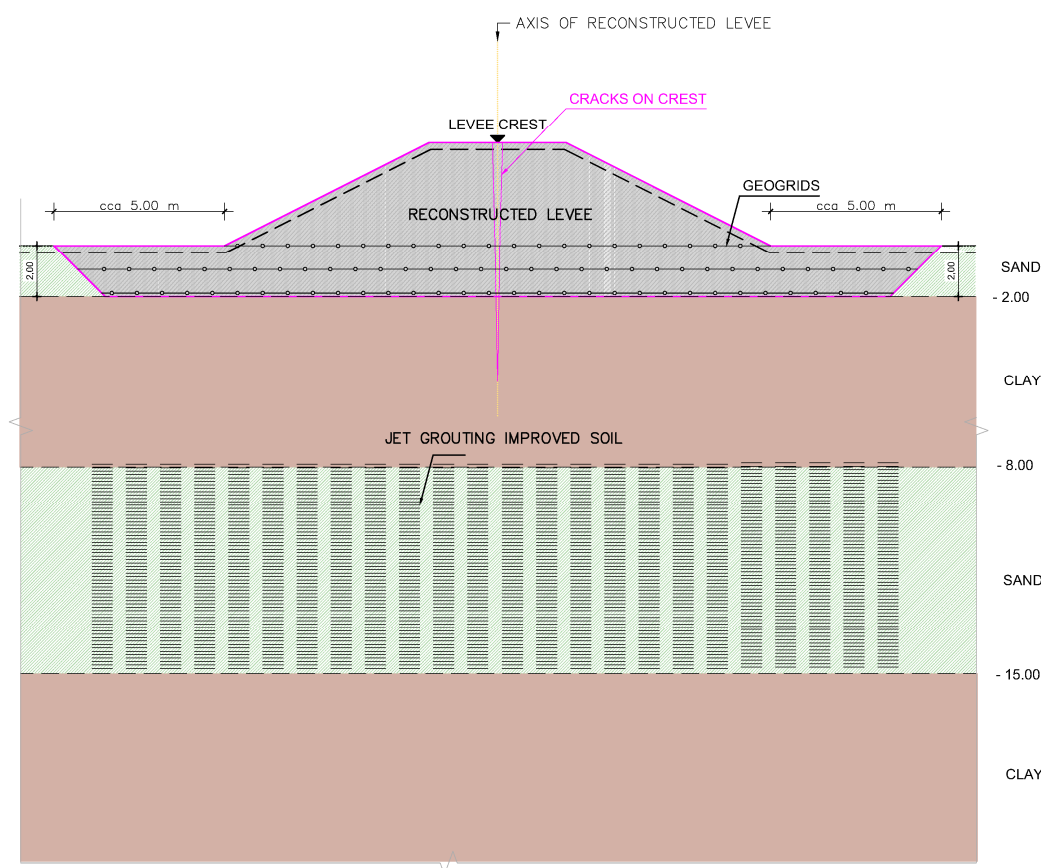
A cross section of reconstructed Hrastelnica levee (CFCE, 2021b)
